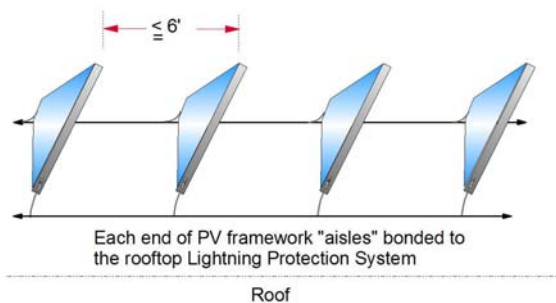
Rows or aisles of photovoltaic panels should be bonded together especially if they are fewer than 6 feet (2 M) apart.
